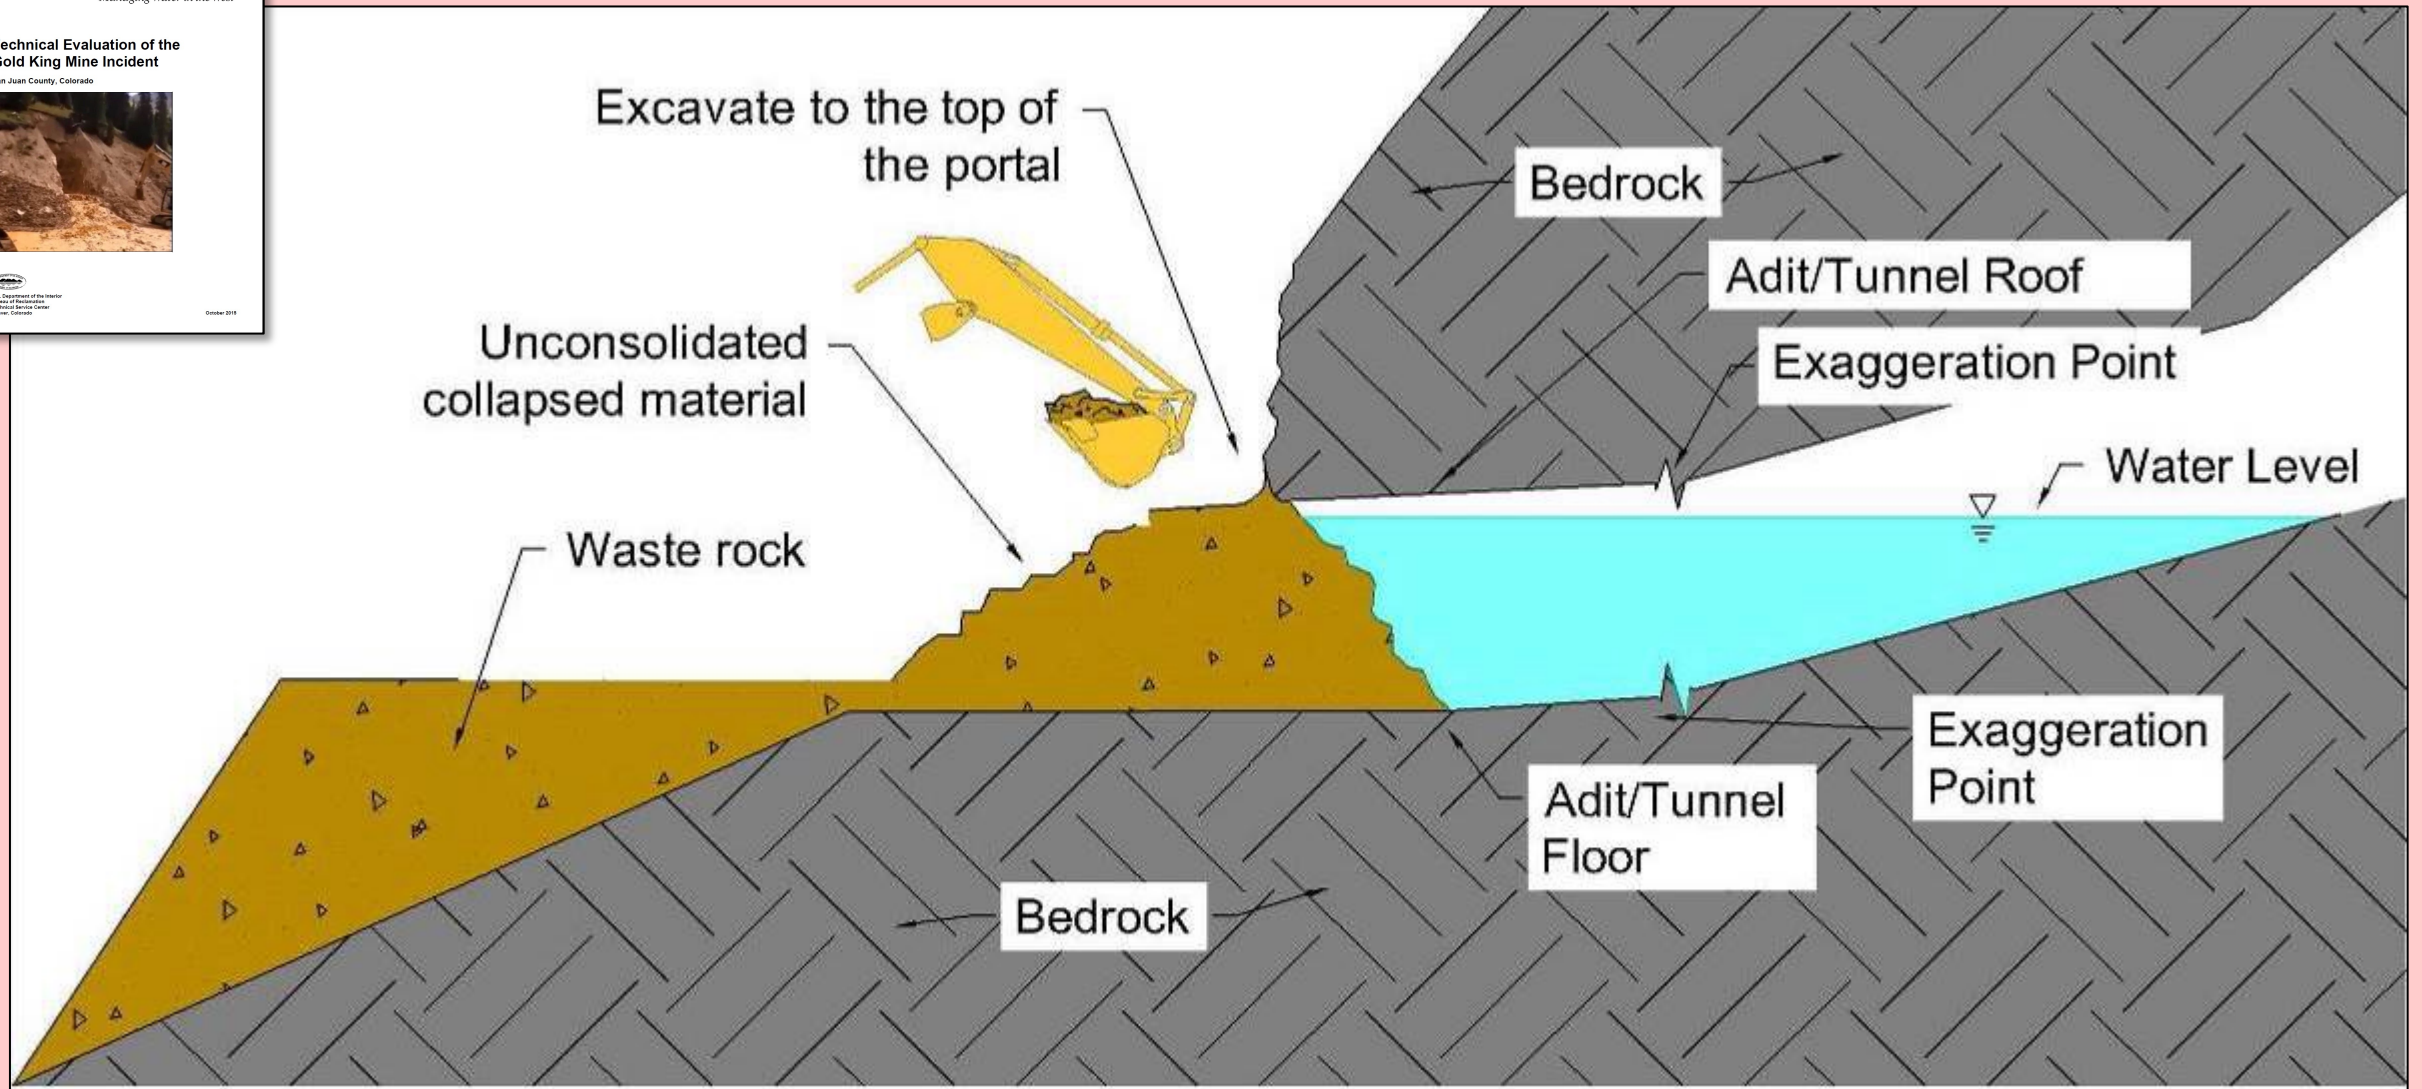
Cross-section illustration showing step 1, the initial excavation to remove the drain pipes and backfill and then carefully excavate the collapsed material to expose the bedrock in the slope above the adit (not to scale).
